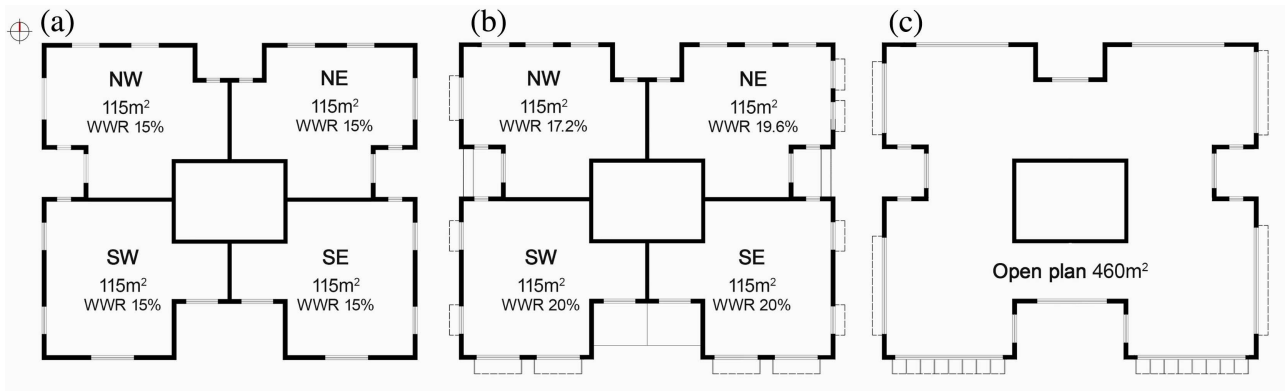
(a) Left: typical four zones floor plan; (b) Middle: typical residential floor plan with IGBS, shading devices and balconies. (c) Right: typical office open plan layout with IGBS and shading devices.
